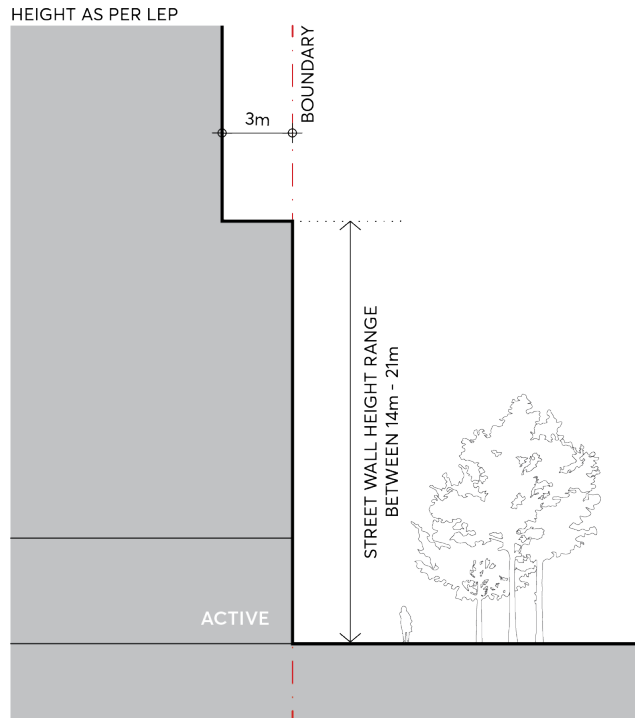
New Civic Space or Park Edge (Section G) Setbacks and Street Wall Height
